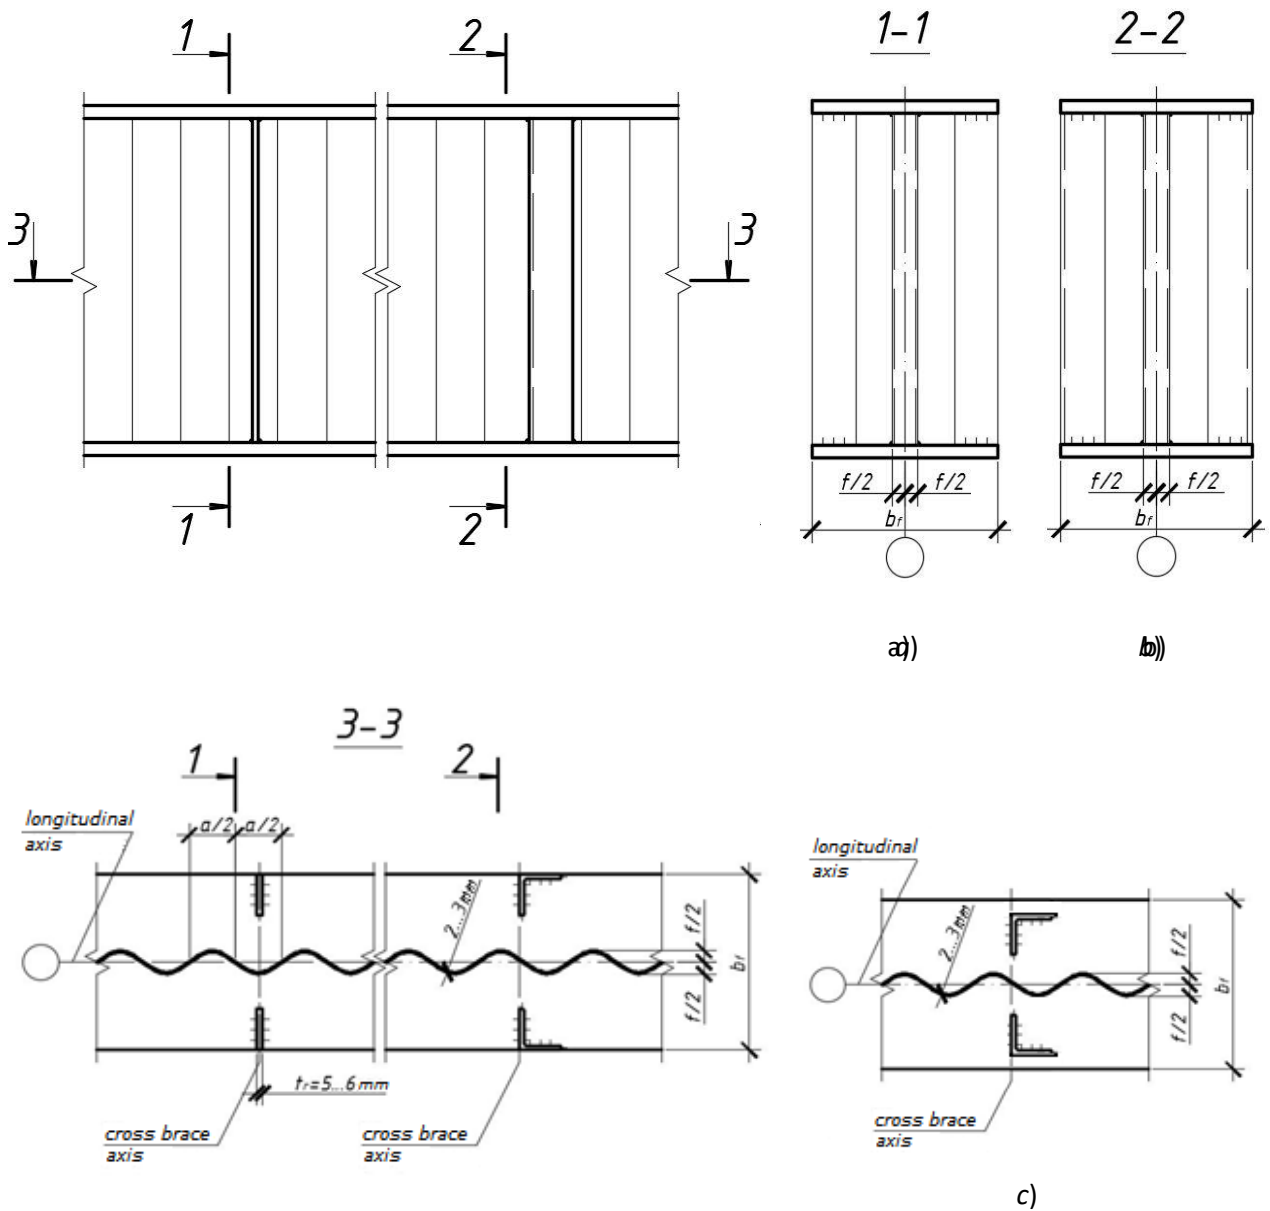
Joint for connection a secondary beam with the corrugated sin-beam via transverse cross brace:
